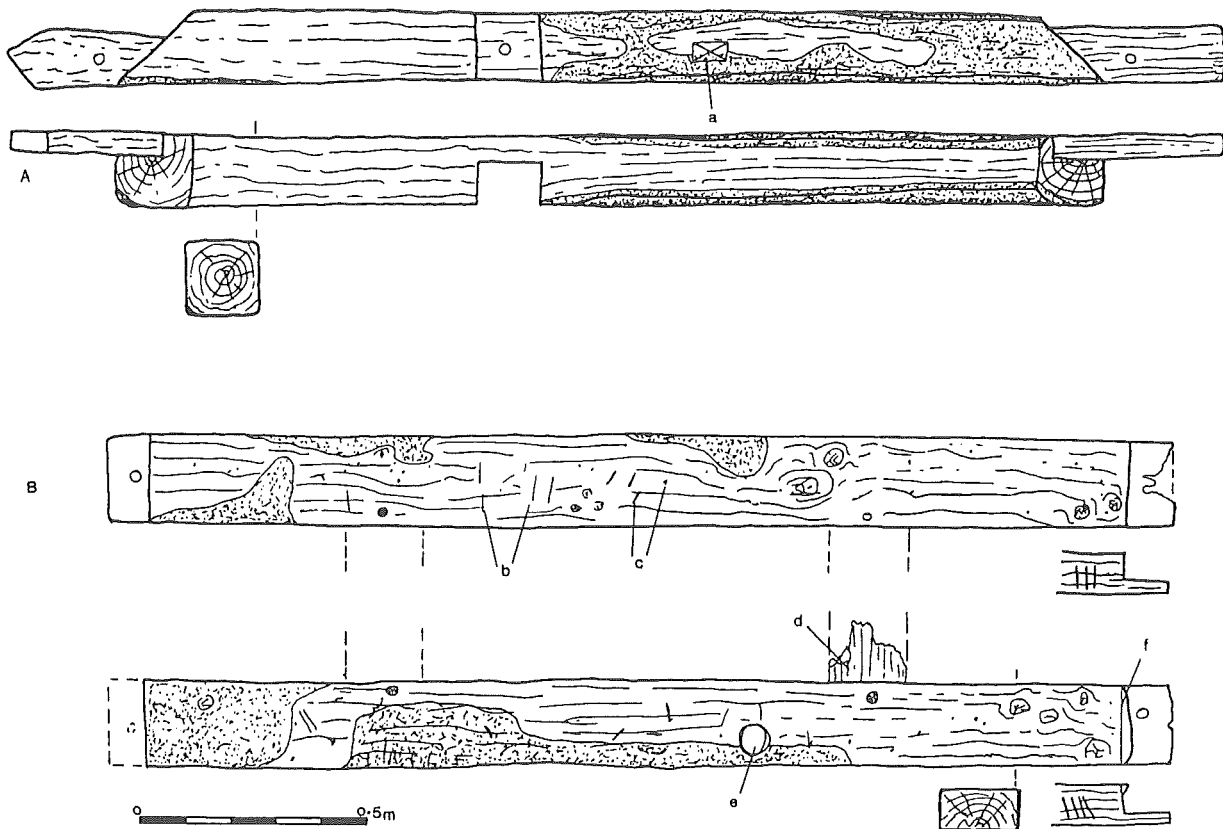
A) Square hewn oak timber from timber framed jetty of 1228-9 at Thames Exchange, London: a) scribed "hewing mark". B) Two oak floor joists from St. Ethelburgas church Bishopsgate, London. Both pit sawn from the same hewn beam c. 1400; b) axe marks; c) iron floor board nails; d) hatch beam fragment; e) bell rope hole; f) scribed line for joint cutting.
